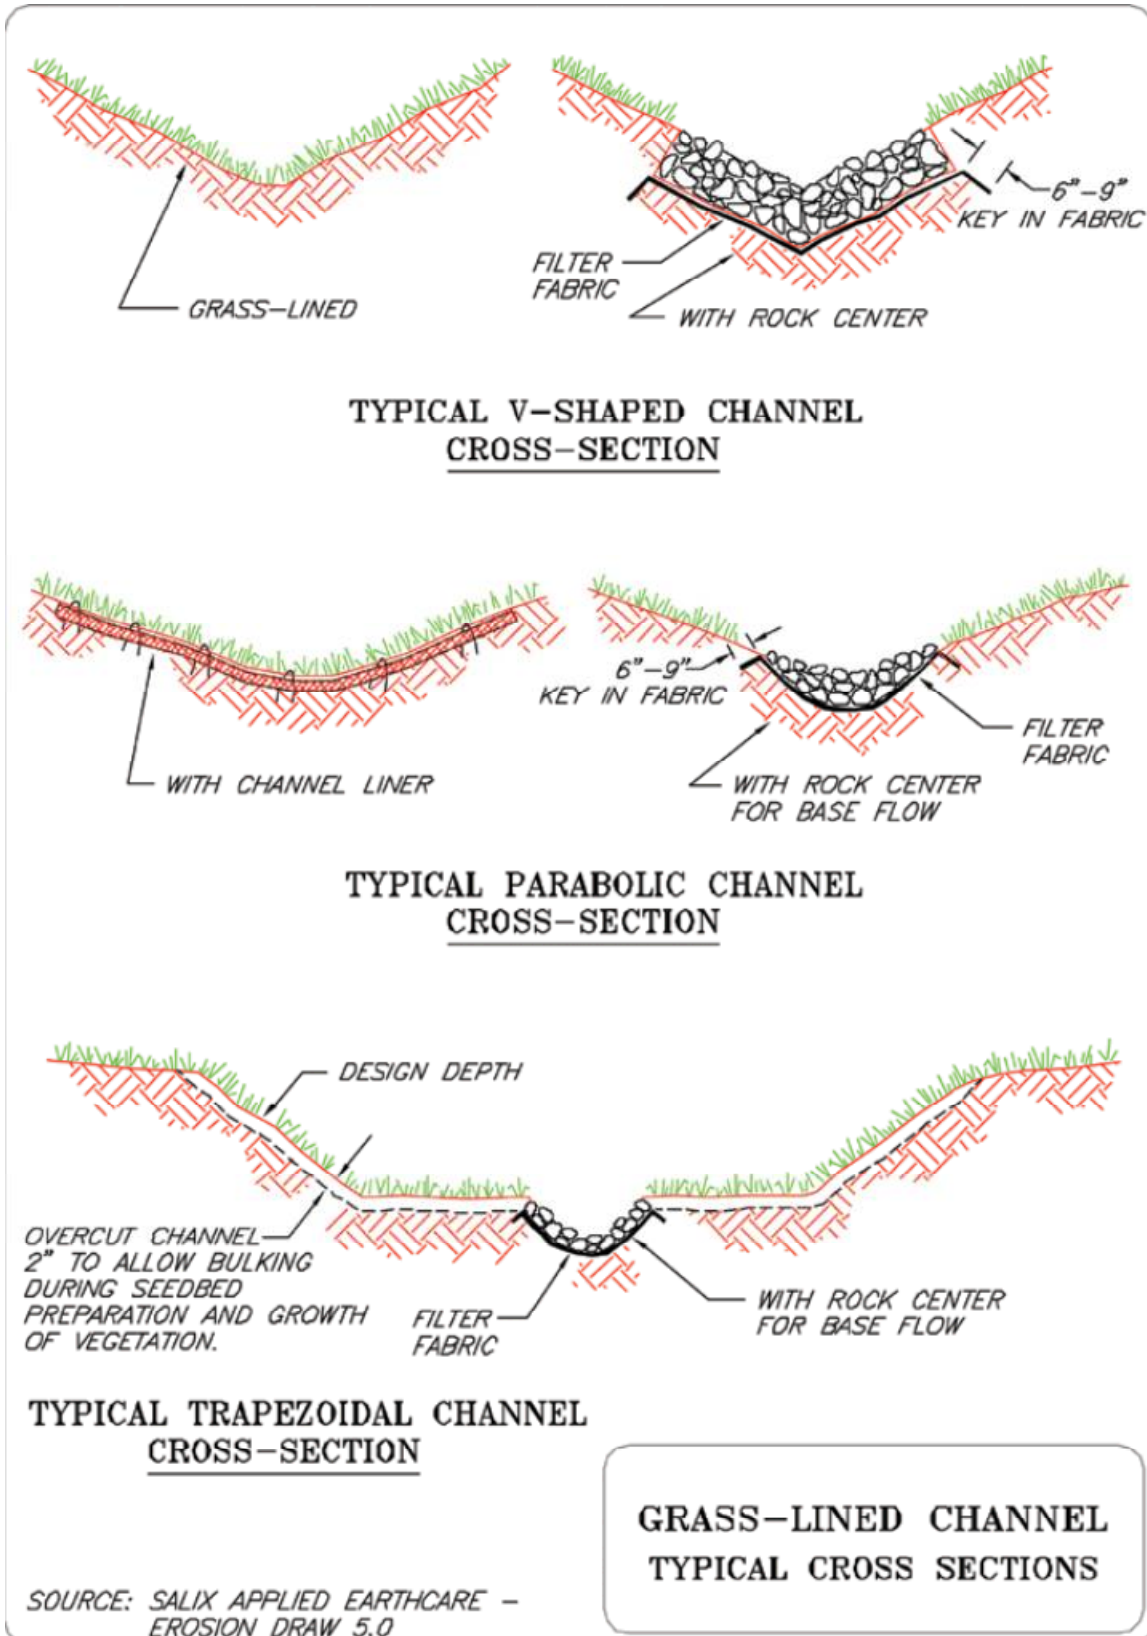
Typical Cross Sections for Grass Lined Channels
